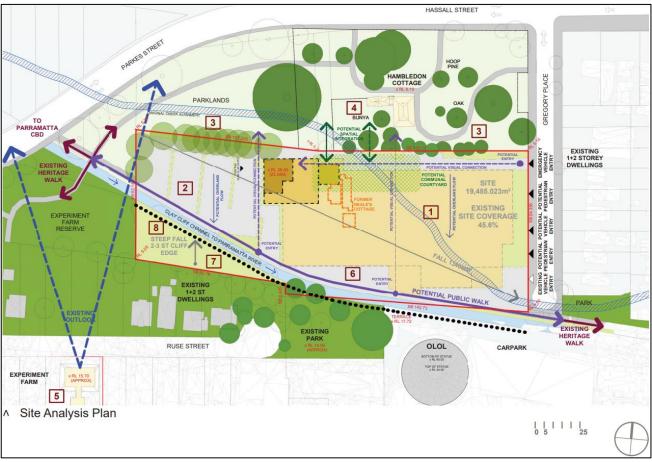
Site Analysis Plan (source: Stanisic Architects)
